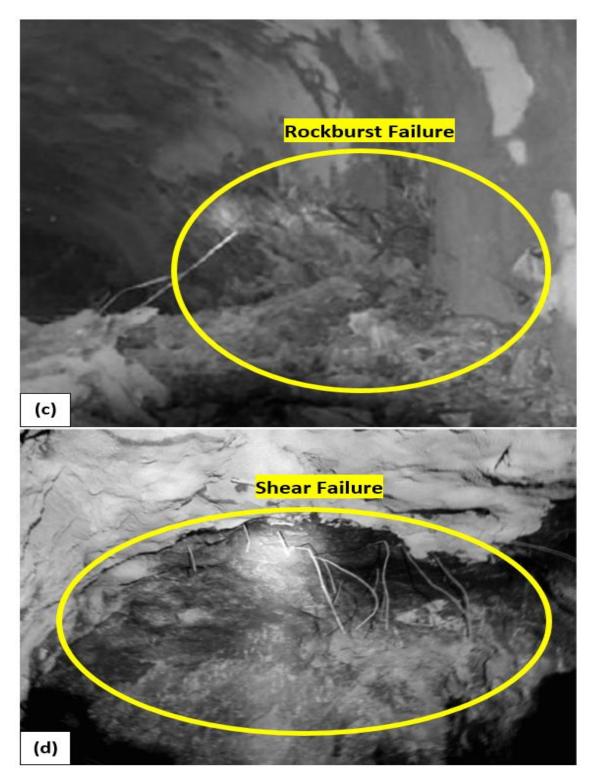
Failure modes observed in the deep underground excavation; (c) rockburst failure, (d) shear failure
